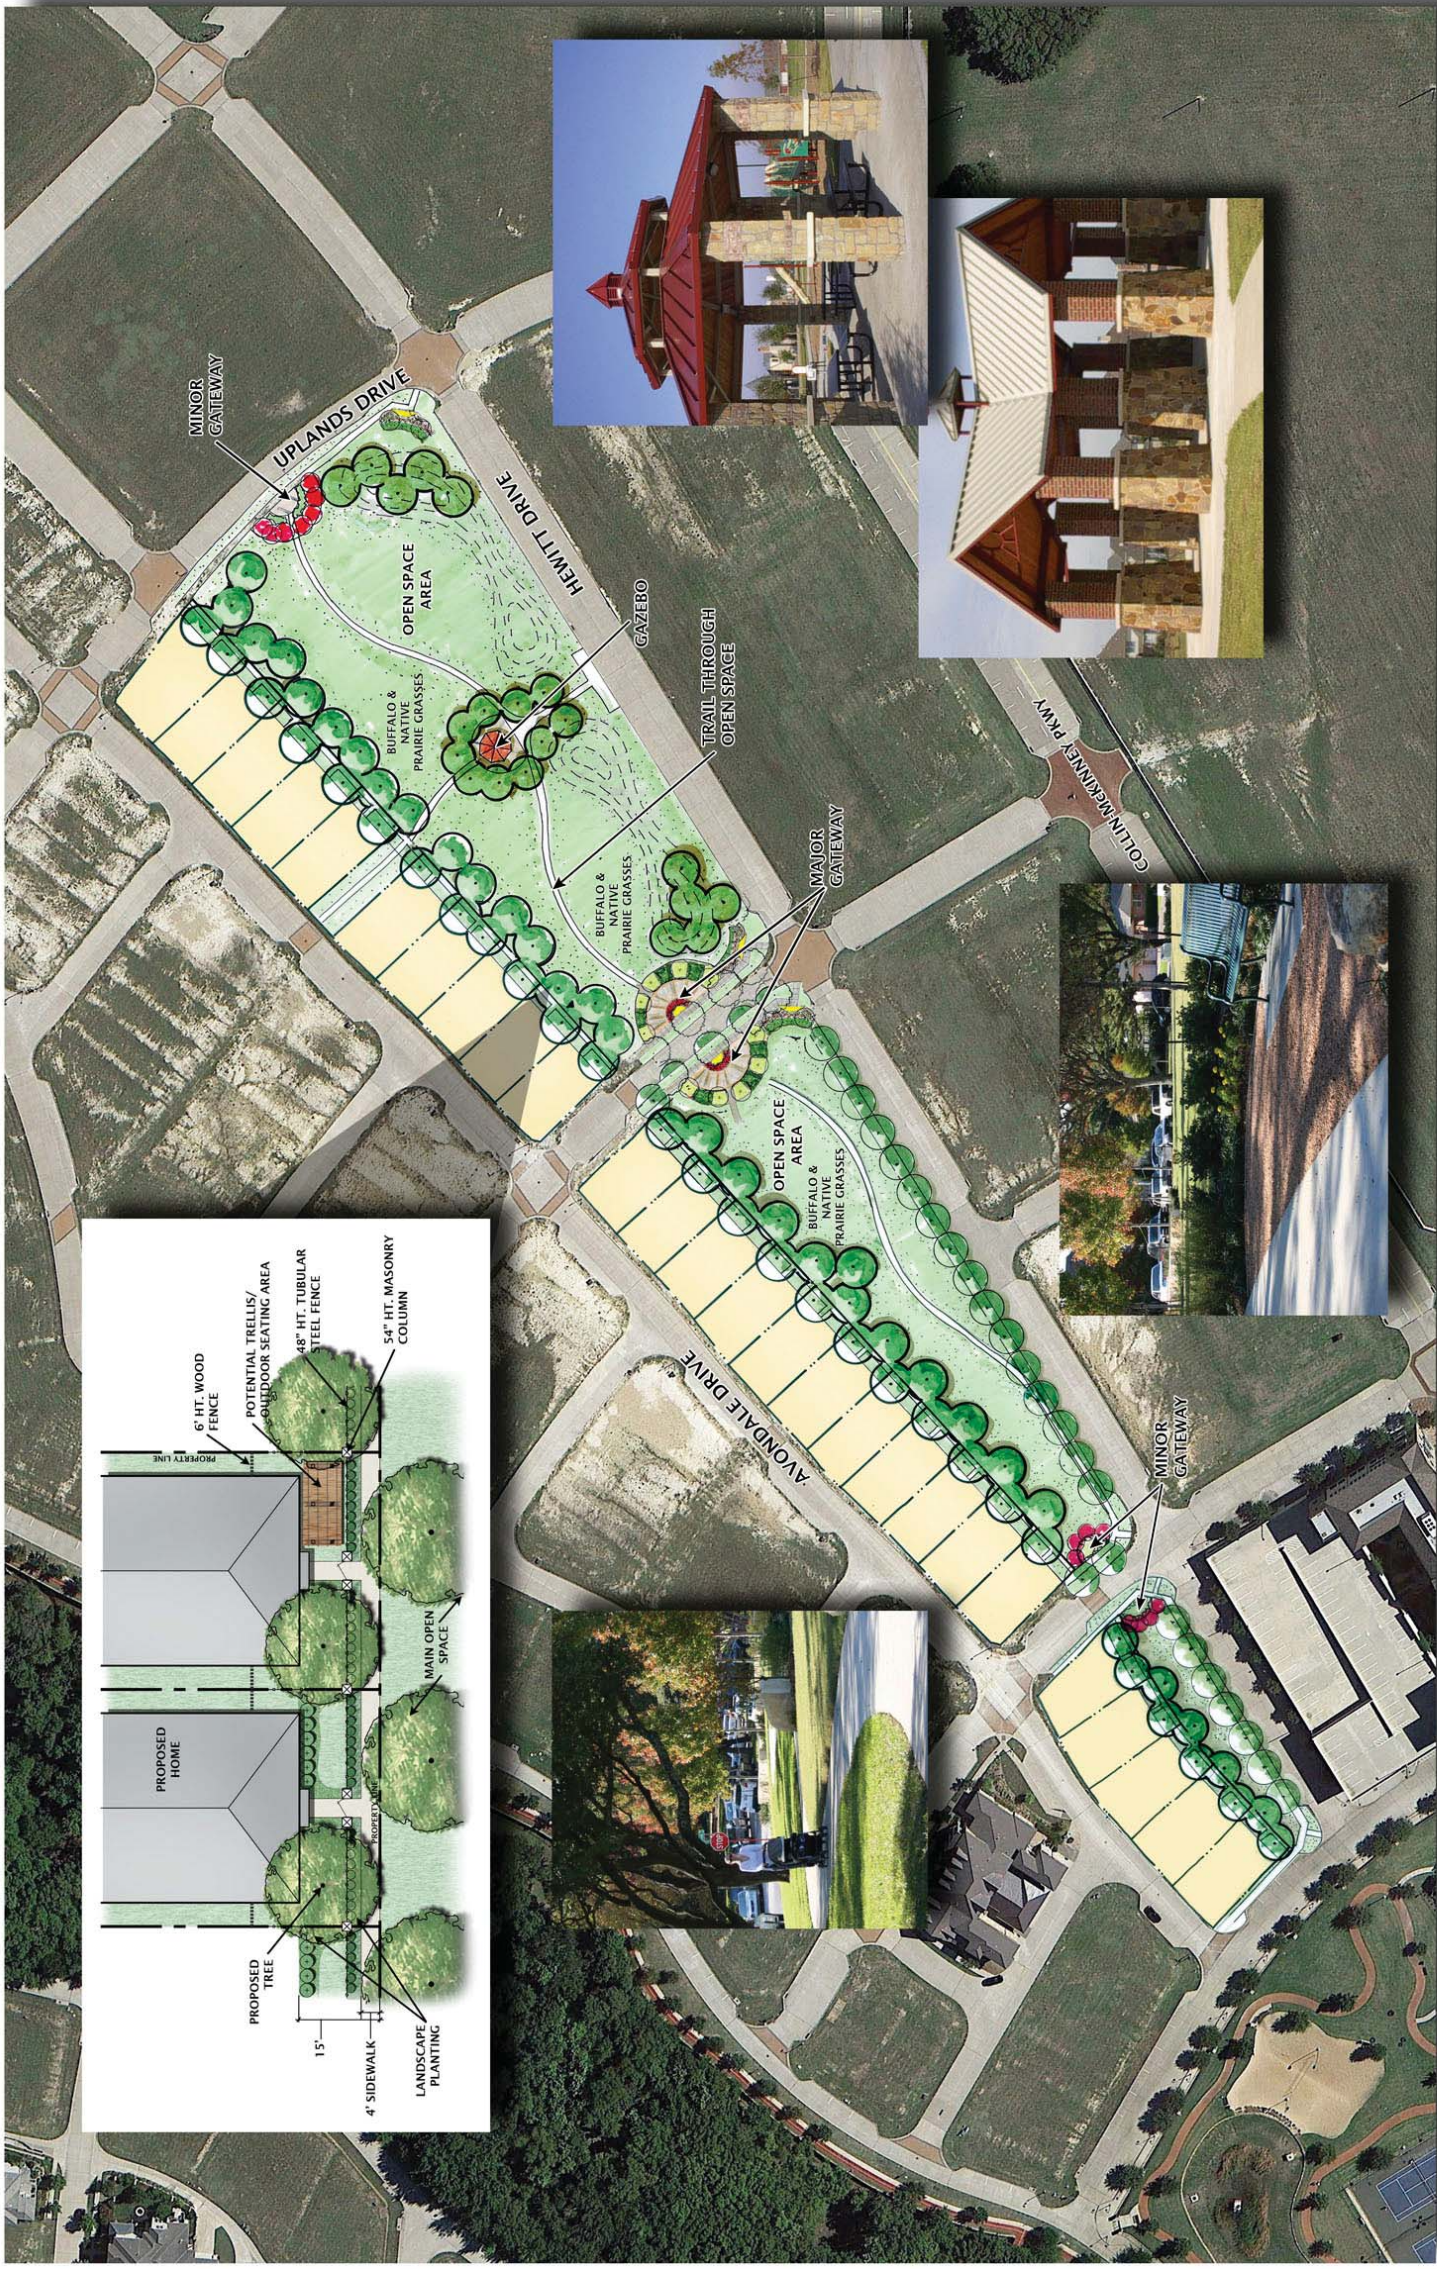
OVERALL NATIVE OPEN SPACE PLAN
